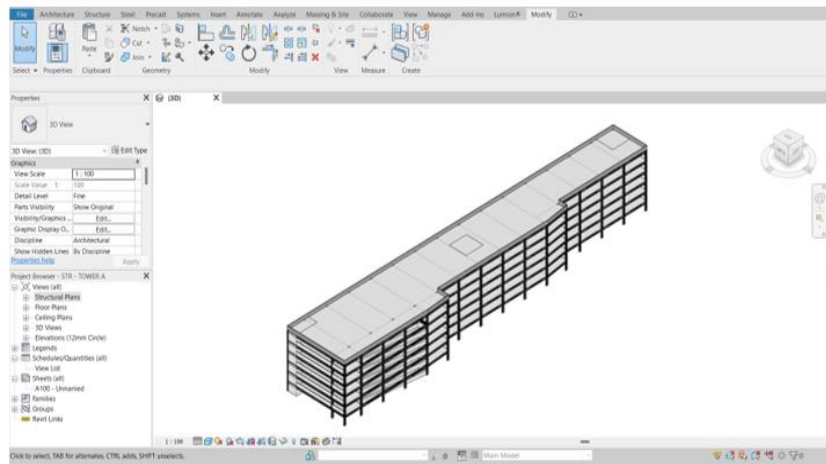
3D Architectural Modelling for Tower B Model Structure
